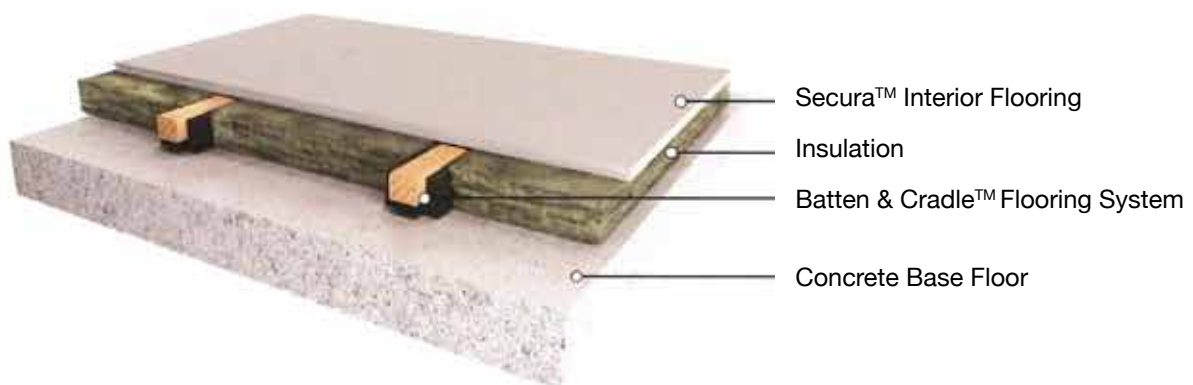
Secura™ Acoustic Floor System over Base Floor - Cradle with sound insulation
